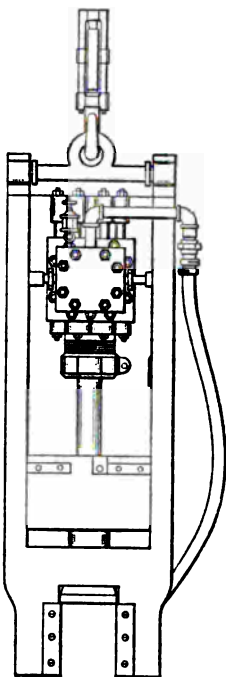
Large-size Power-hammer for Driving Sheet-piling Planks
